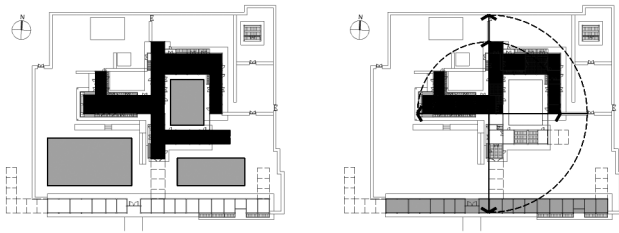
占-Shaped Plan & 品-Shaped Outdoor Space
